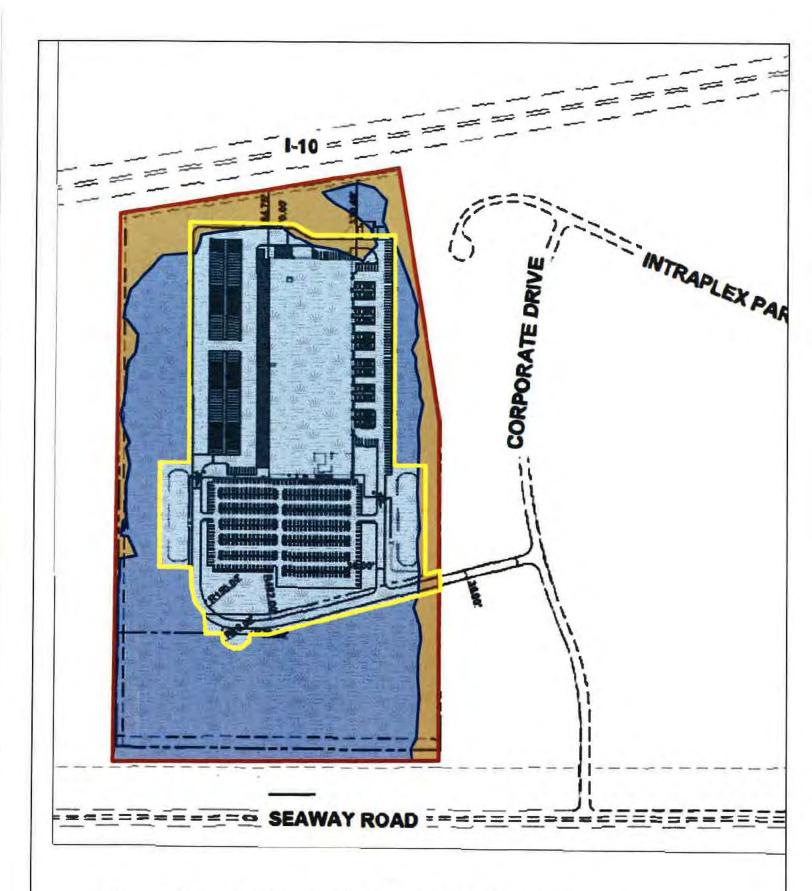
Wetland Impacts Associated with the Modified Expansion Plan
